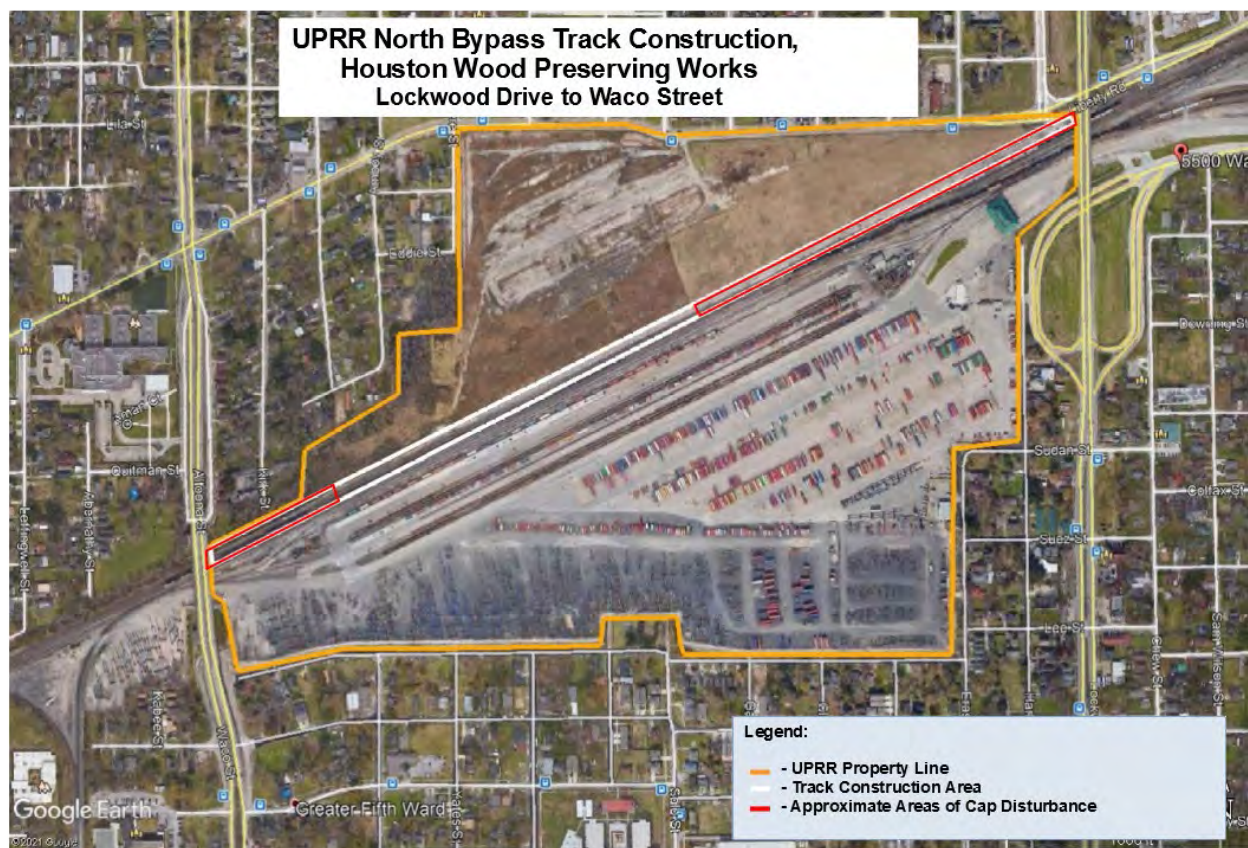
Site Plan for UPRR North Bypass Track Construction Project, Houston Wood Preserving Works (Lockwood Drive to Waco Street)
